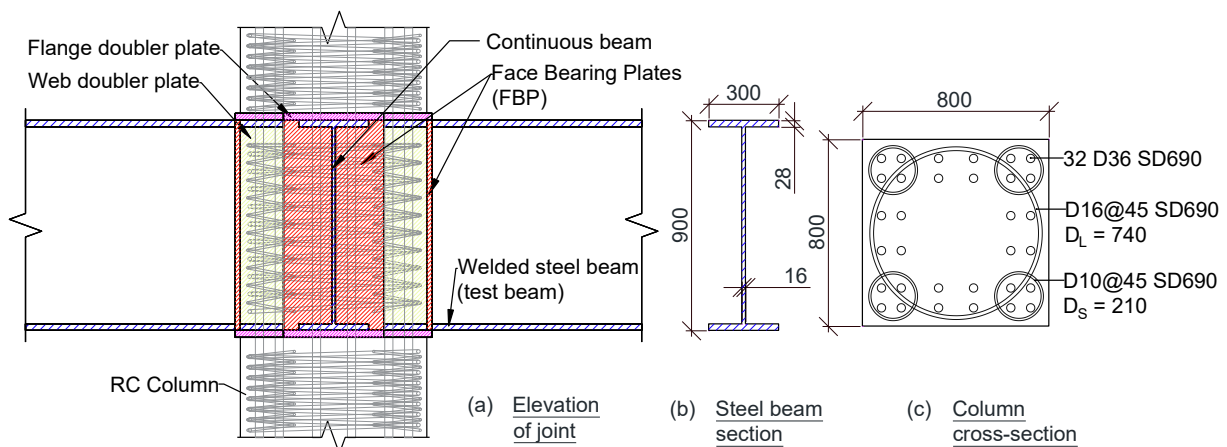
A) elevation of proposed new-rs joint, b) h-beam cross-section, and c) rc column cross-section (unit: mm).
